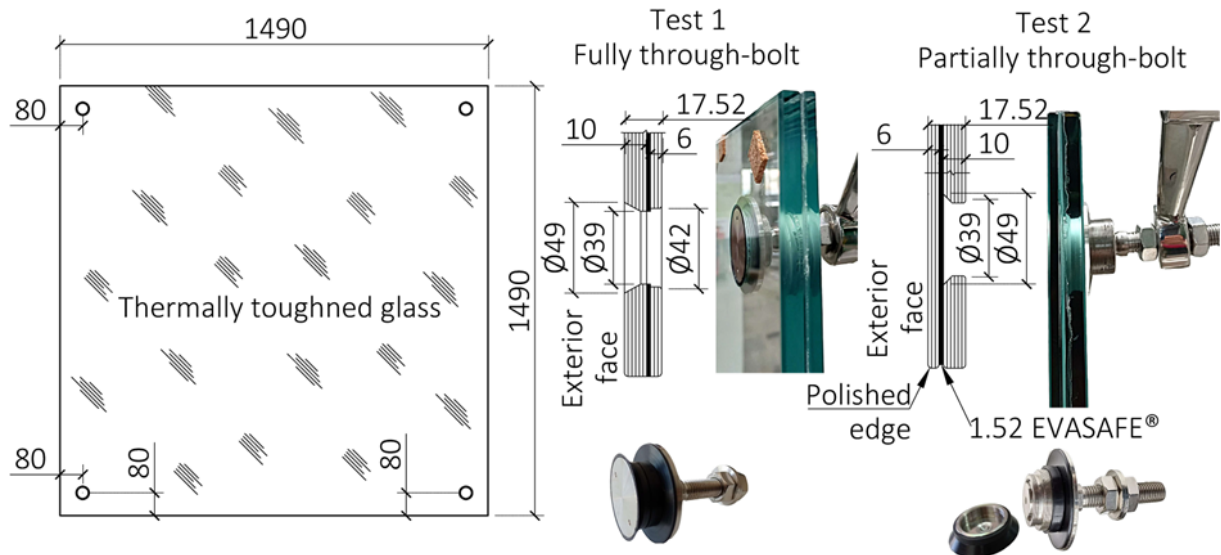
Layout and geometry of the glass panels and fixings (dimensions in mm).
